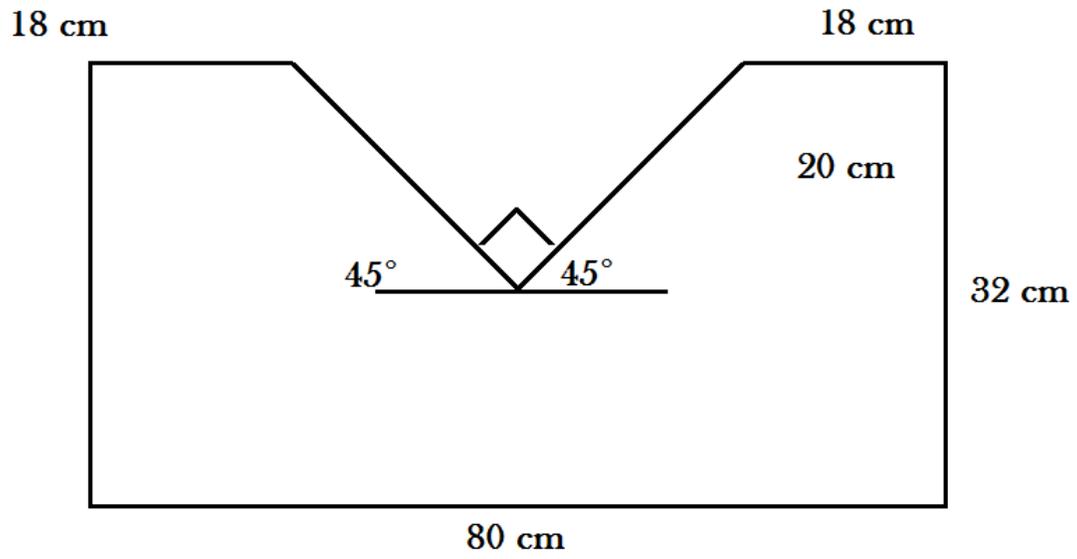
Details of a 90° v-notch weir showing typical dimensions
